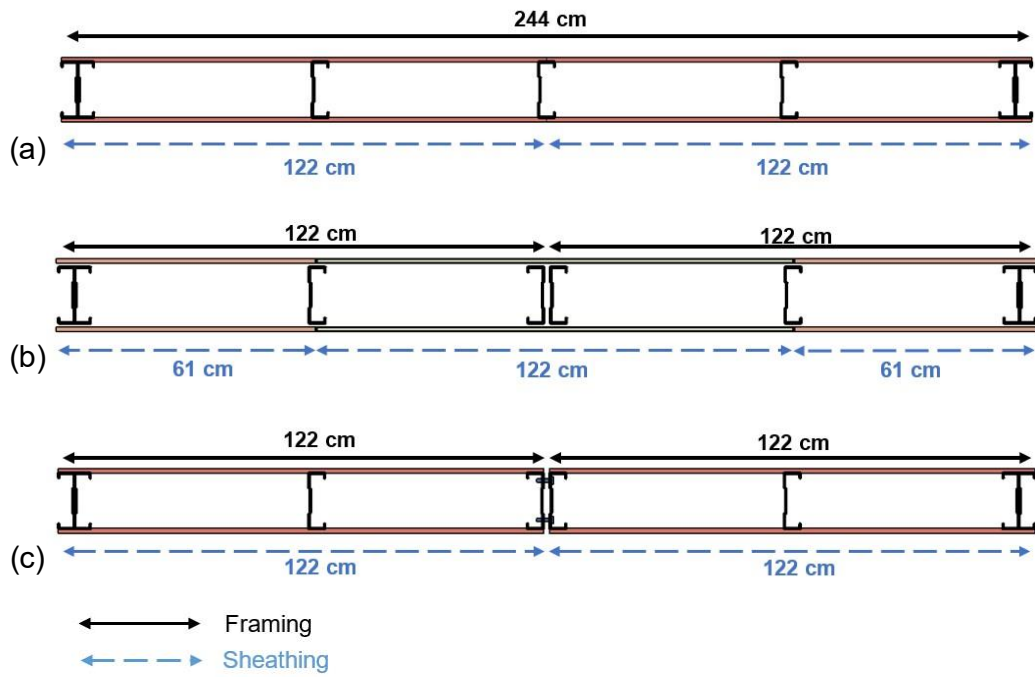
Shear wall connection configurations: (a) single framing (Type A); (b) wall segments are connected by OSB sheathing (Type B); (c) wall segments are connected by fasteners (Type C)
